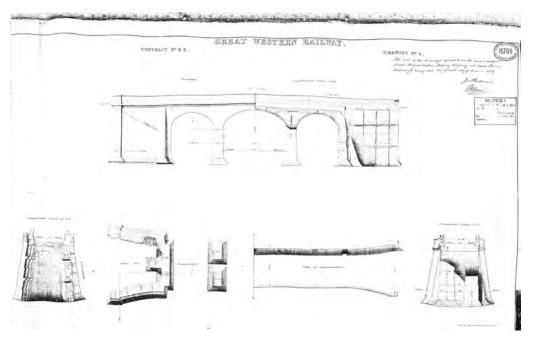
Bourton Overbridge (MLN1 7215) contract drawing, June 1839, signed I. K. Brunel. See next page for a photograph. The half section, bottom, shows an internal buttress in the abutment and the arch within the pier, both characteristic features of Brunel bridges on the GWML (drawing from the Network Rail National Records Centre)
